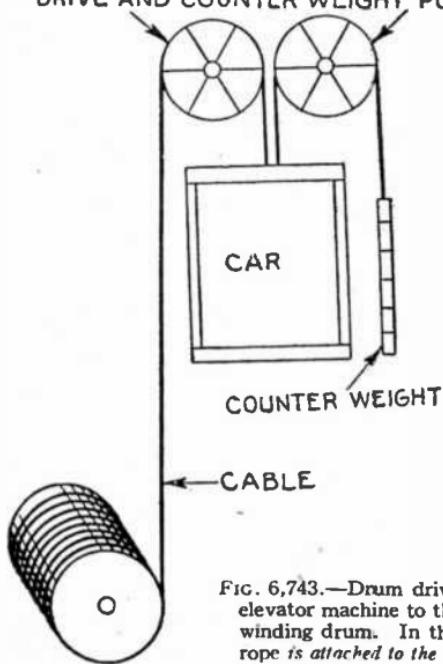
,743.—Drum drive or method of transmitting power from the elevator machine to the car by means of winding the hoist rope on a winding drum. In this arrangement the end of the counter weight rope is attached to the car.
